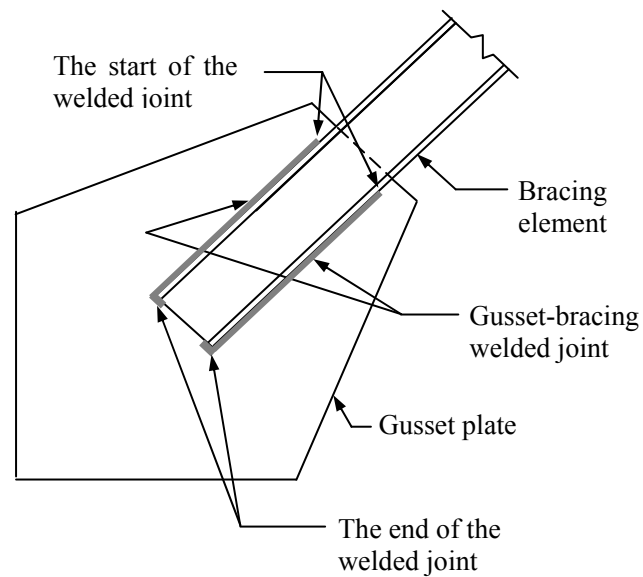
Gusset Plate-bracing Element Welded Joint
